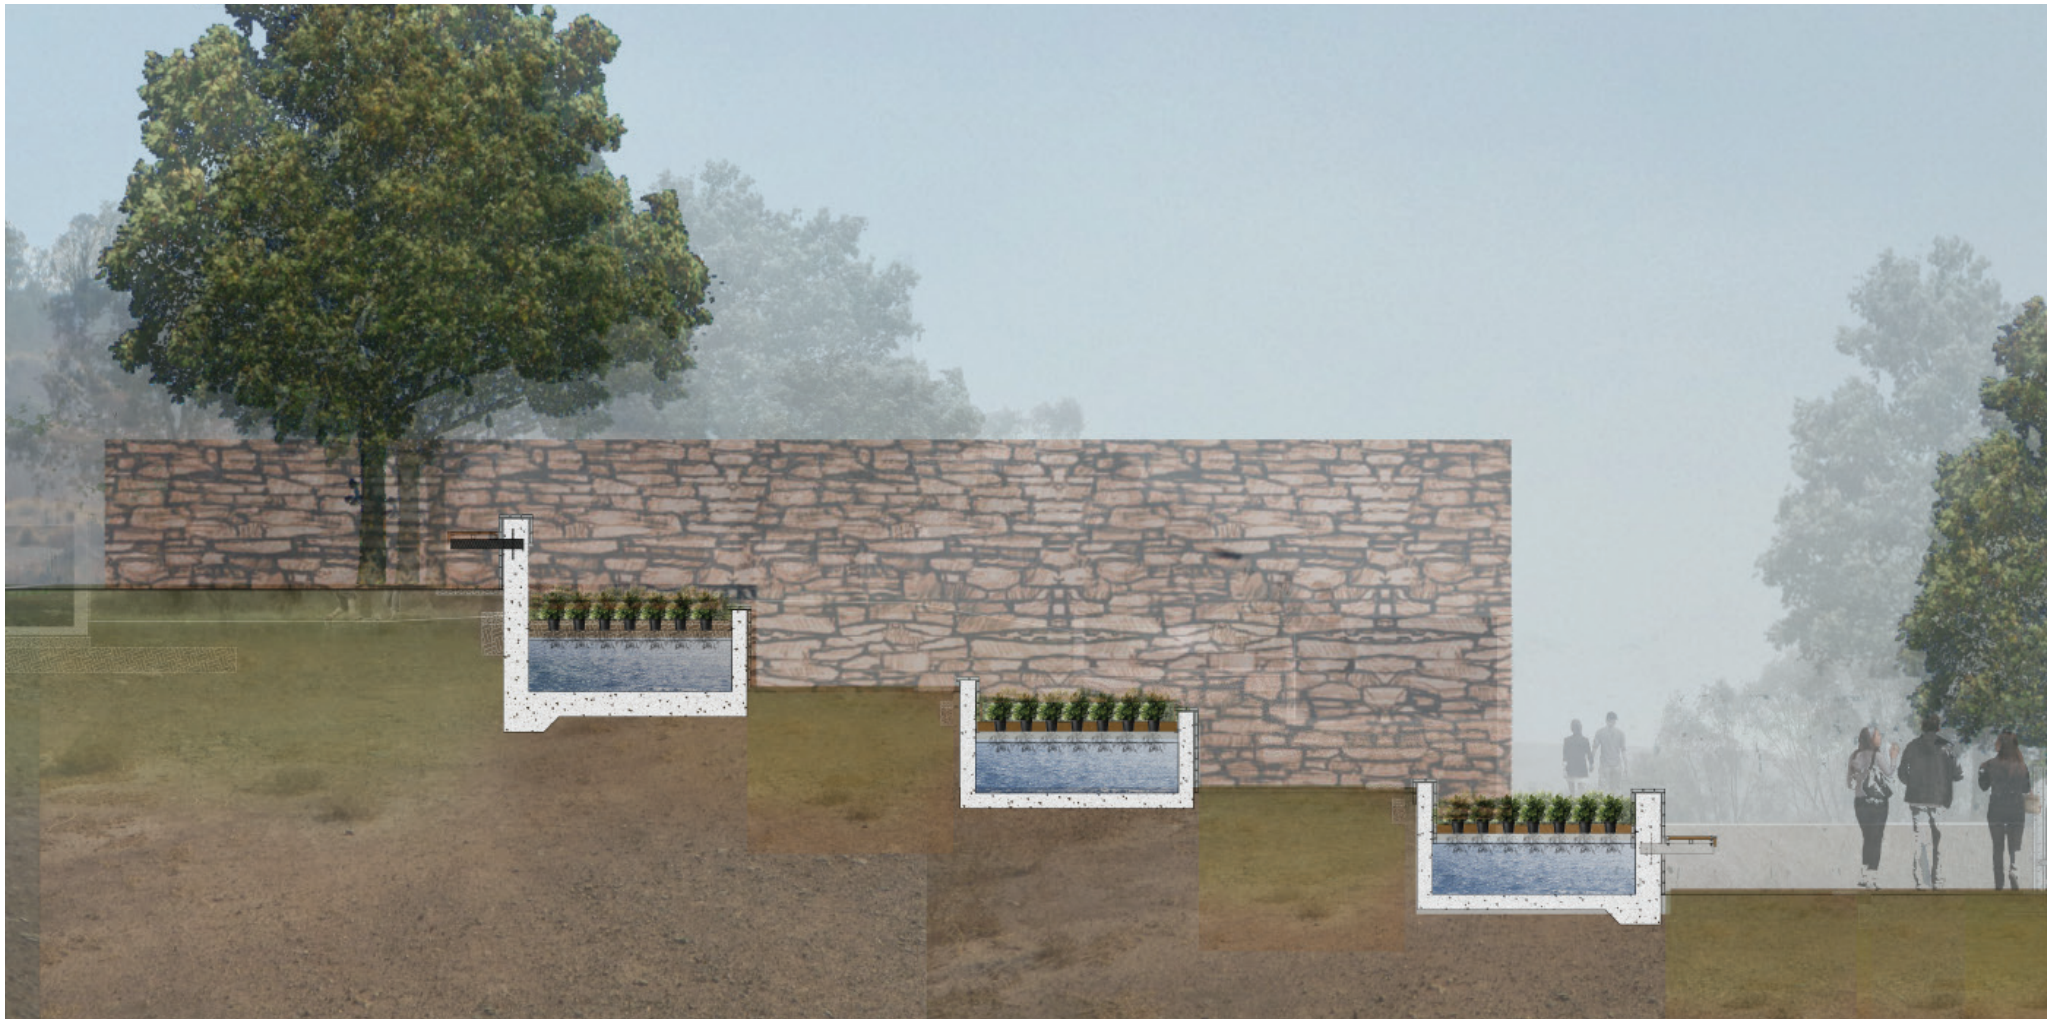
Construction detail of retaining wall and aquaculture tanks. (Author, 2015)
